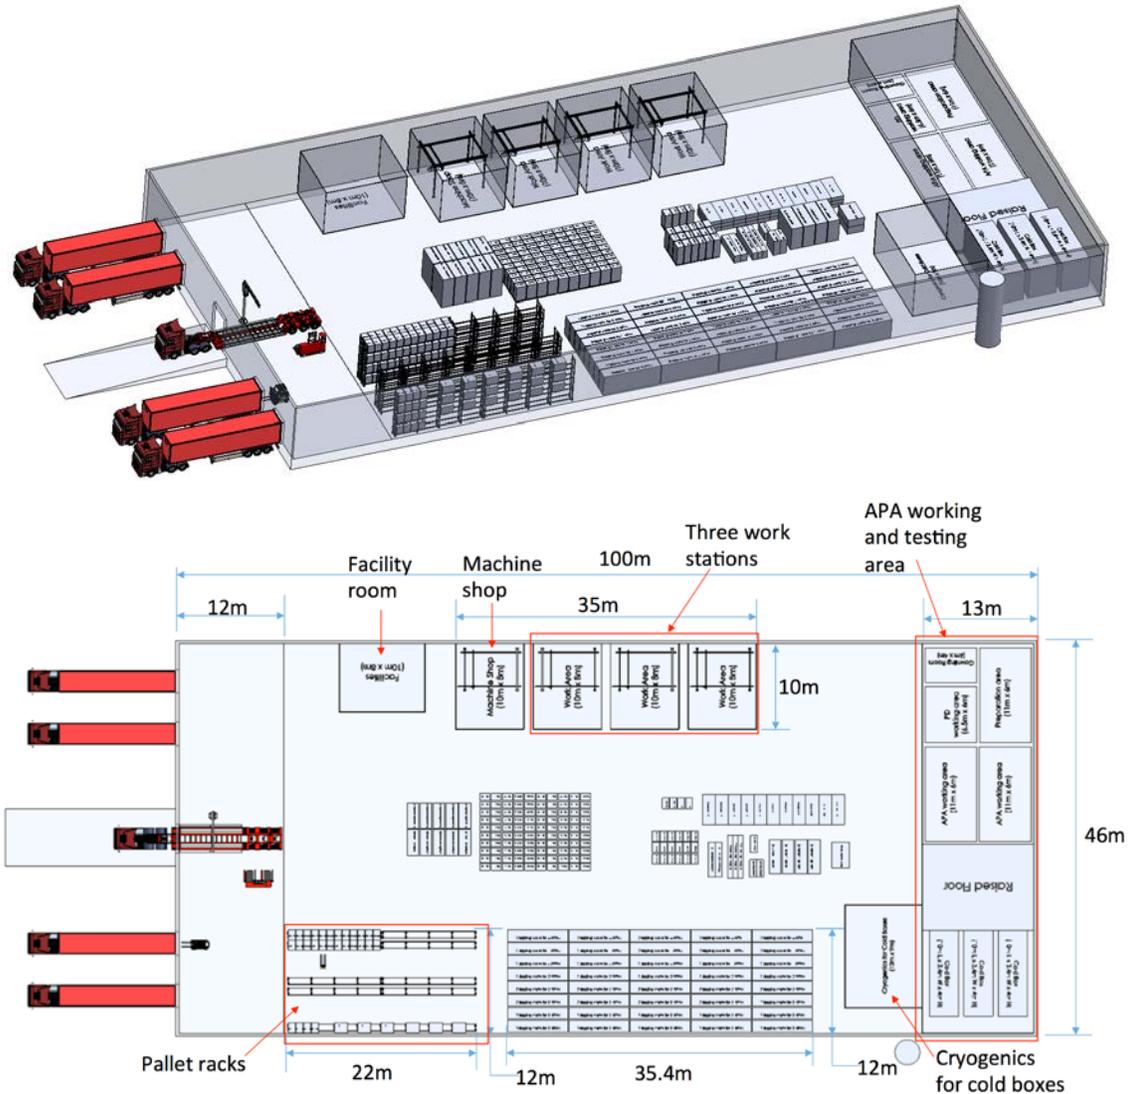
Top panel — isometric view of the ITF building. Bottom Panel — plan view of the revised building layout.
